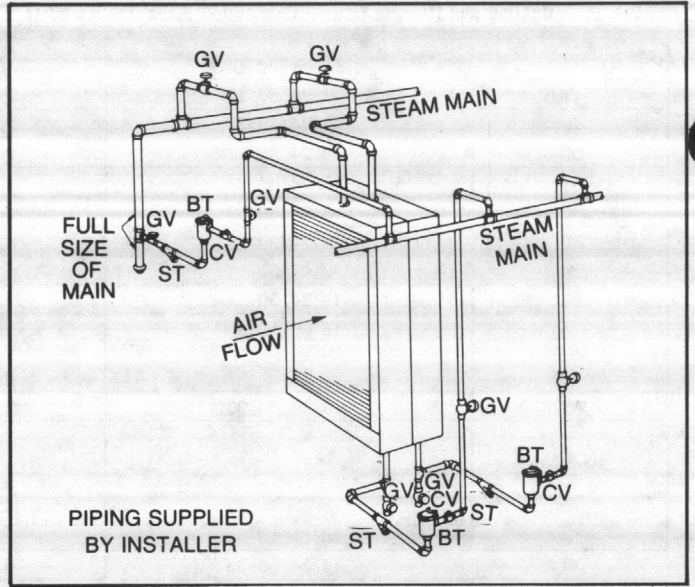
Typical Piping for Type A Steam Coils, High Pressure, Vertical Tubes for Horizontal Airflow
